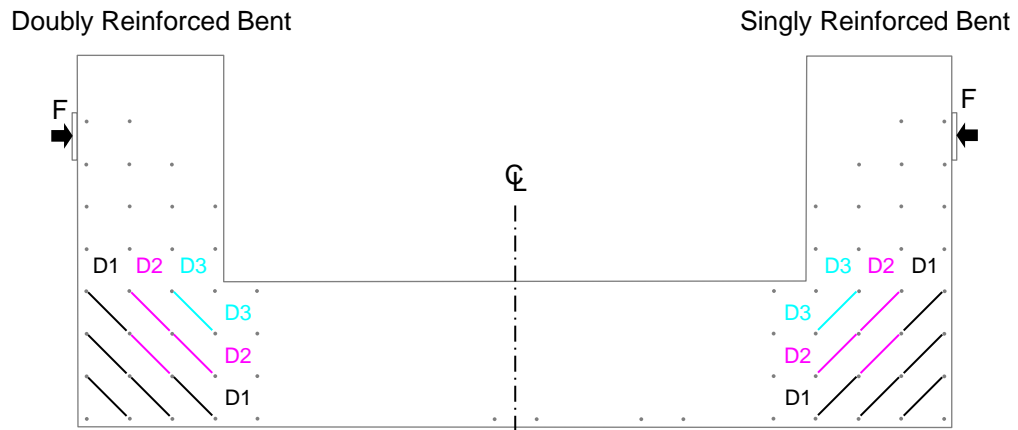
Layout of DEMEC Measurements (DM): Diagonal Readings in Beam, Diagonal Readings in Beam-Column Joint, and Out-of-Plane Readings in Beam-Column Joint
